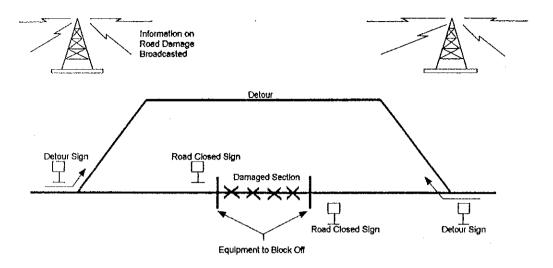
Presentation of Road Damage Information to Road Users
